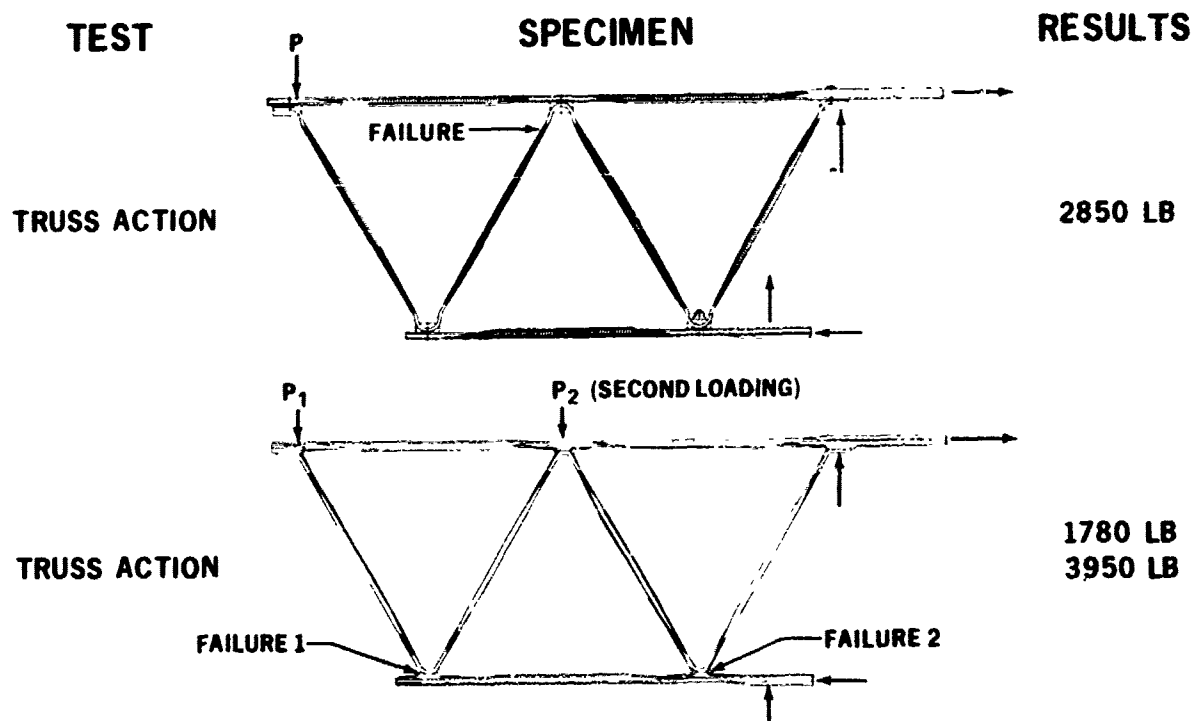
TRUSS ACTION SPECIMEN TEST RESULTS
